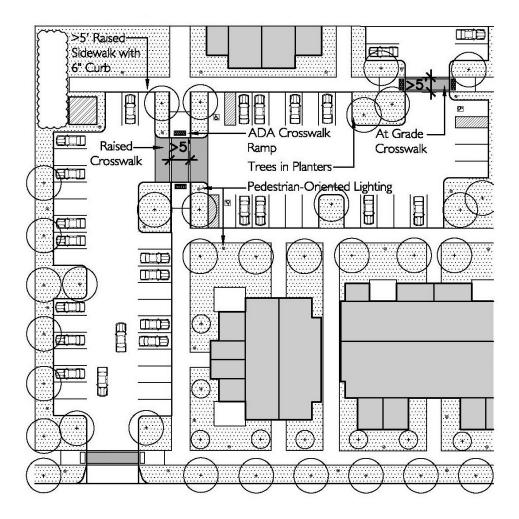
B.4. Dividing Parking Lots into Separate Areas
